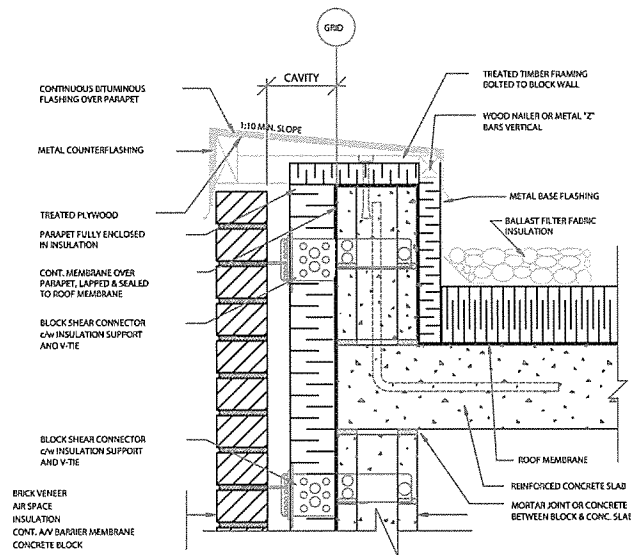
Brick / Block Detail of Low Parapet W/ Protected Membrane Roof
